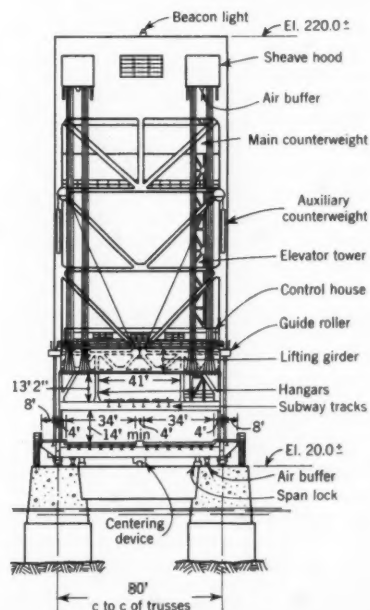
Elevation of tower shows hangers supporting the upper floor beams at their quarter points. The hangers are suspended from the sway frames at the top chord over the subway deck.
